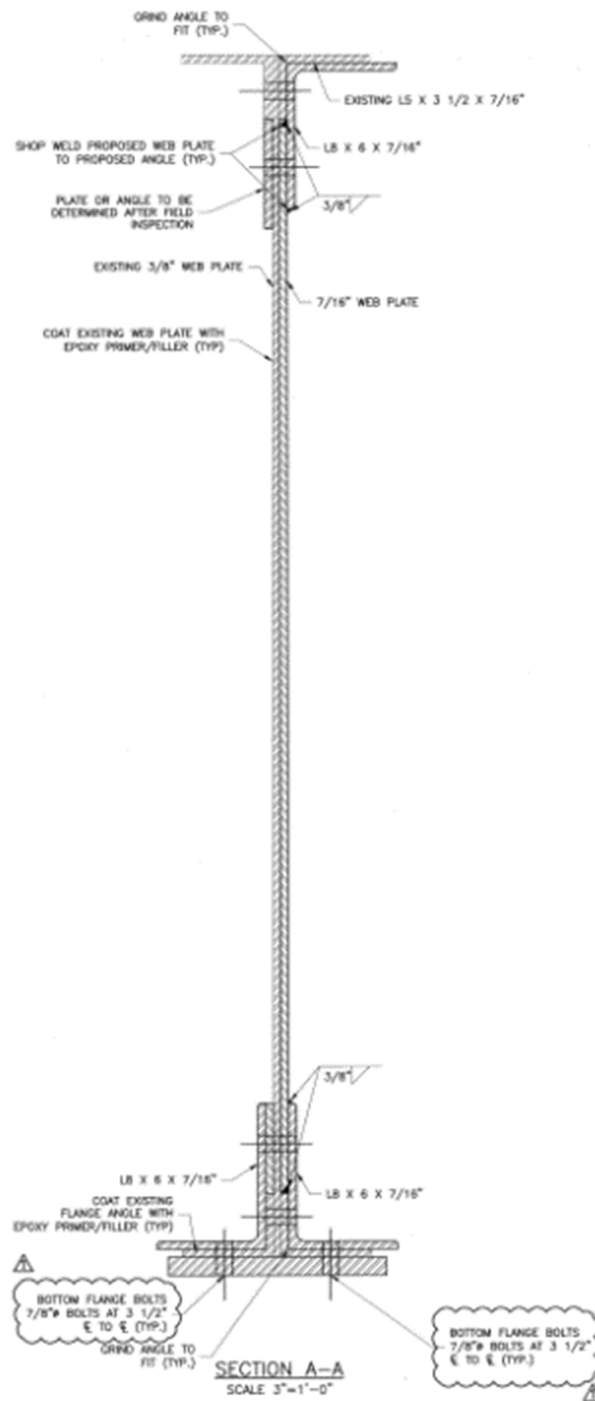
Floor Beam Repair, Detail (2014 Repair Plans)
